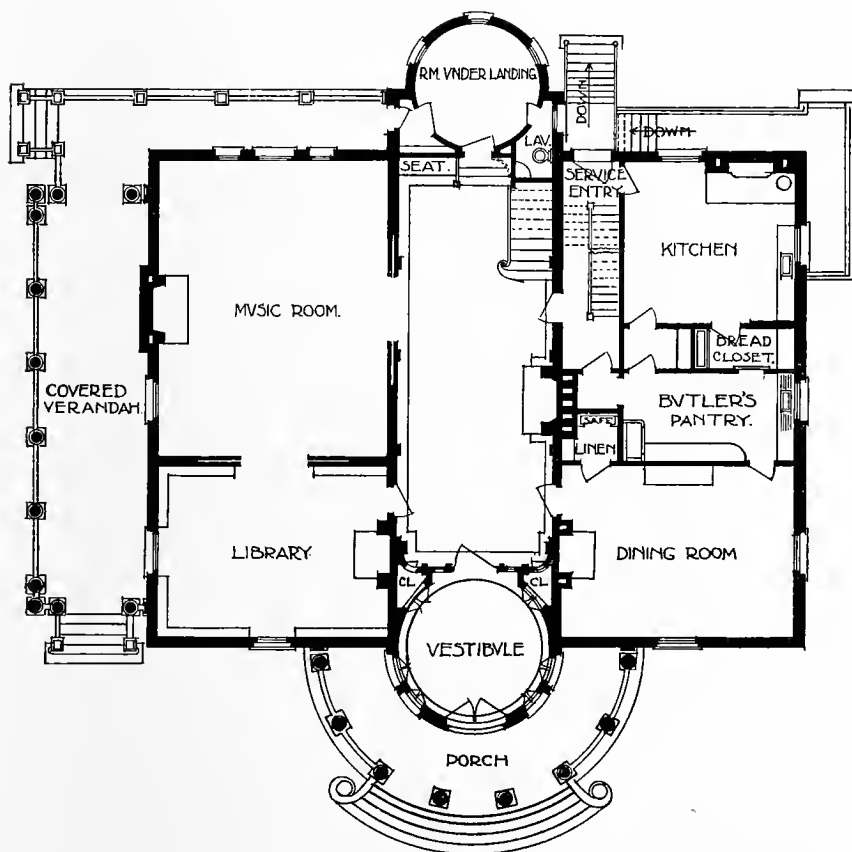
PLAN OF GROUND FLOOR, RESIDENCE OF EDWIN GINN, ESQ., WINCHESTER, MASS.
